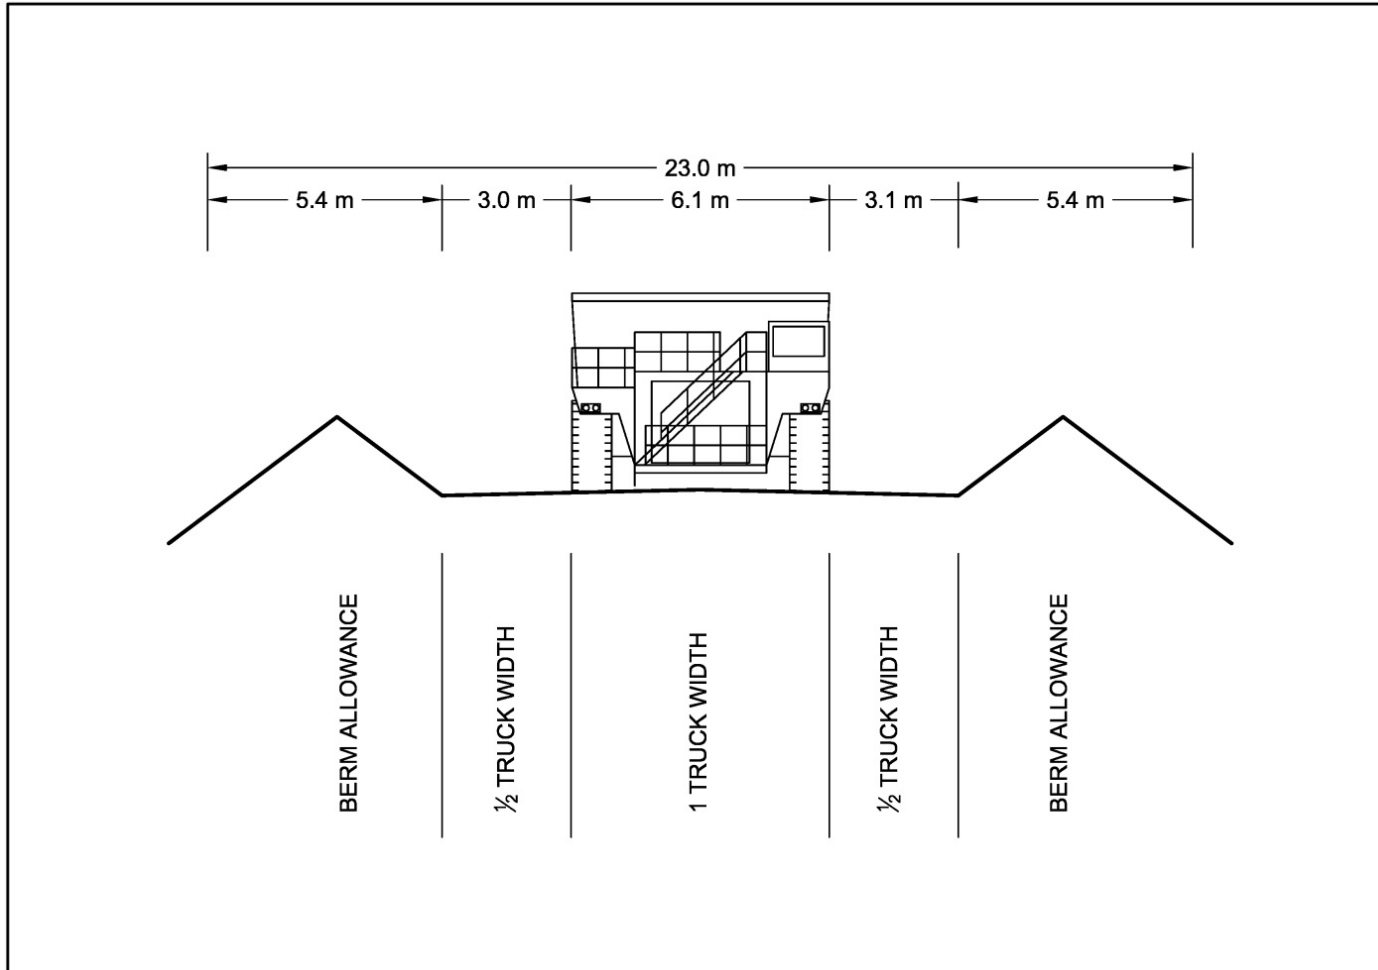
Dual Lane External Haul Road Cross Section
